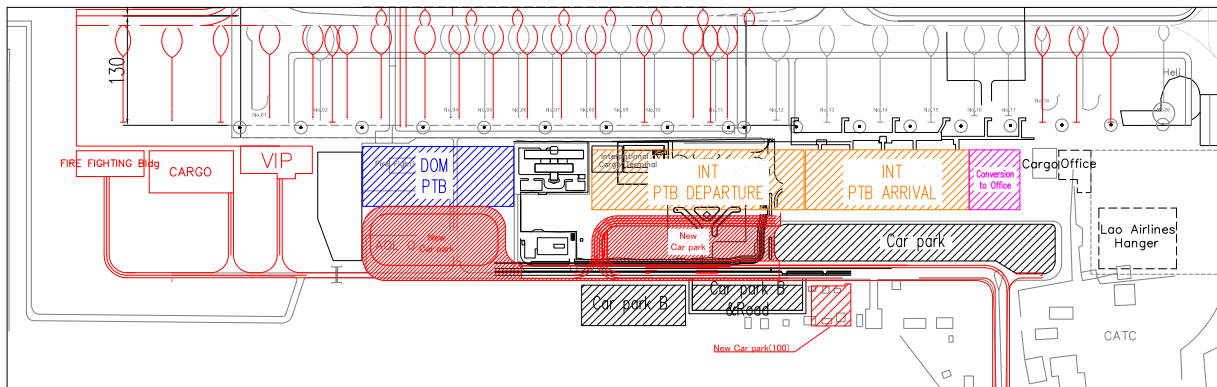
Case-3 Improvement Plan of Terminal Area
